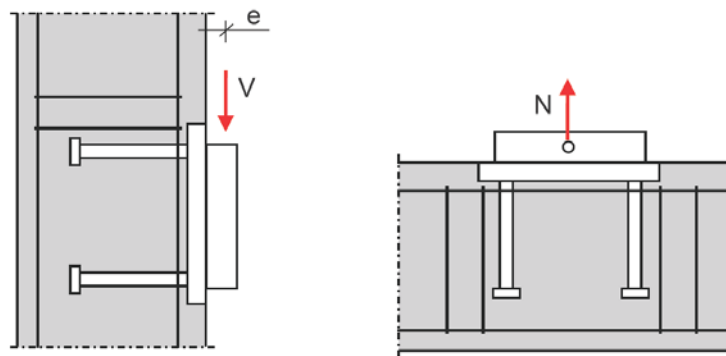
Anchor plates with welded studs submitted to shear or tension
